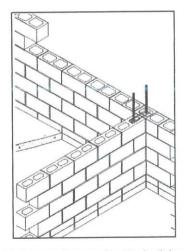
Starter Bar at the End of the Wall (Source: Modul Pemasangan CMU Projek PPR Tanjong Karang)
